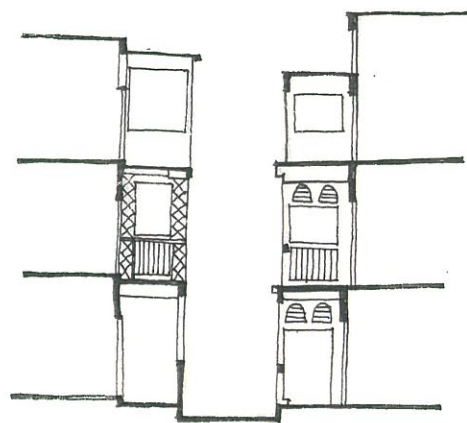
POSSIBLE STREET SECTION SHOWING CHANGE IN BUILDING HEIGHT AND SCALE.
